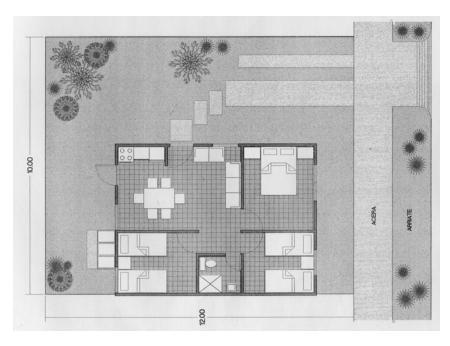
Layout Type 3 house Only in principal avenue. Design make possible the use of the house for the development of micro interprises.
